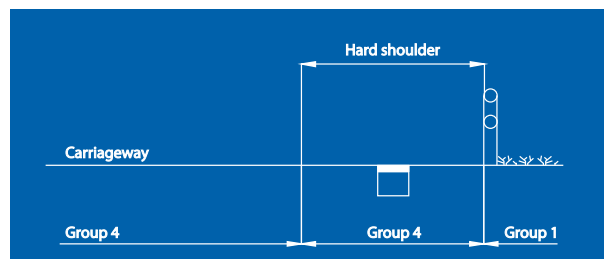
Typical detail of a hard shoulder showing the location of some installation groups
